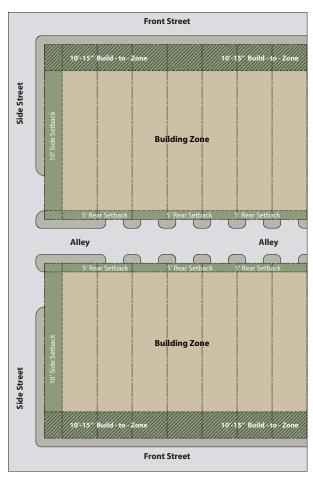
The building footprint may occupy any part of the building zone and build-to zone, subject to the maximum lot coverage limit.
